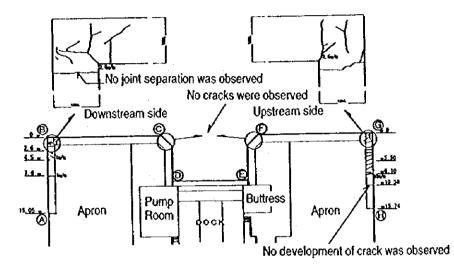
Crack Locations in the Coping Concrete Sections in the Upriver Revetment.
